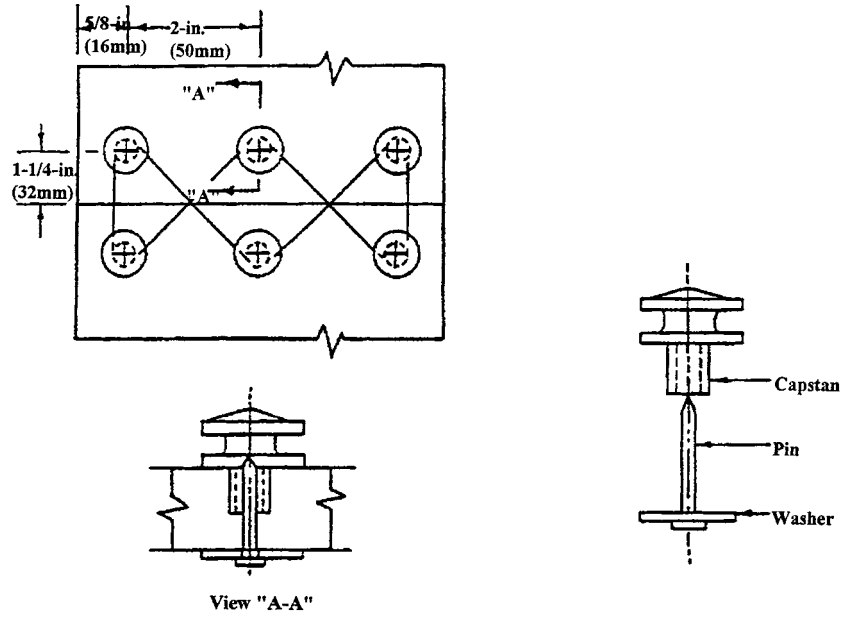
Alternate Method of Lacing Removable Covers Using Lacing Capstan Assembly Sets
